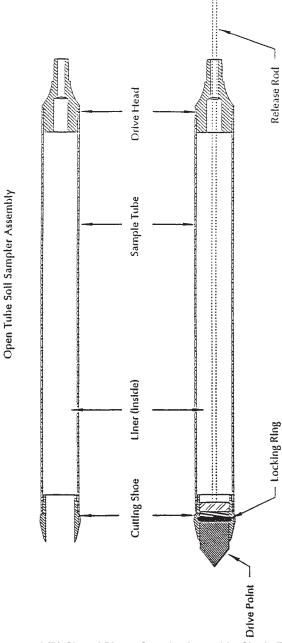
(A) Open and (B) Closed Piston Sampler Assembly, Single Tube System
